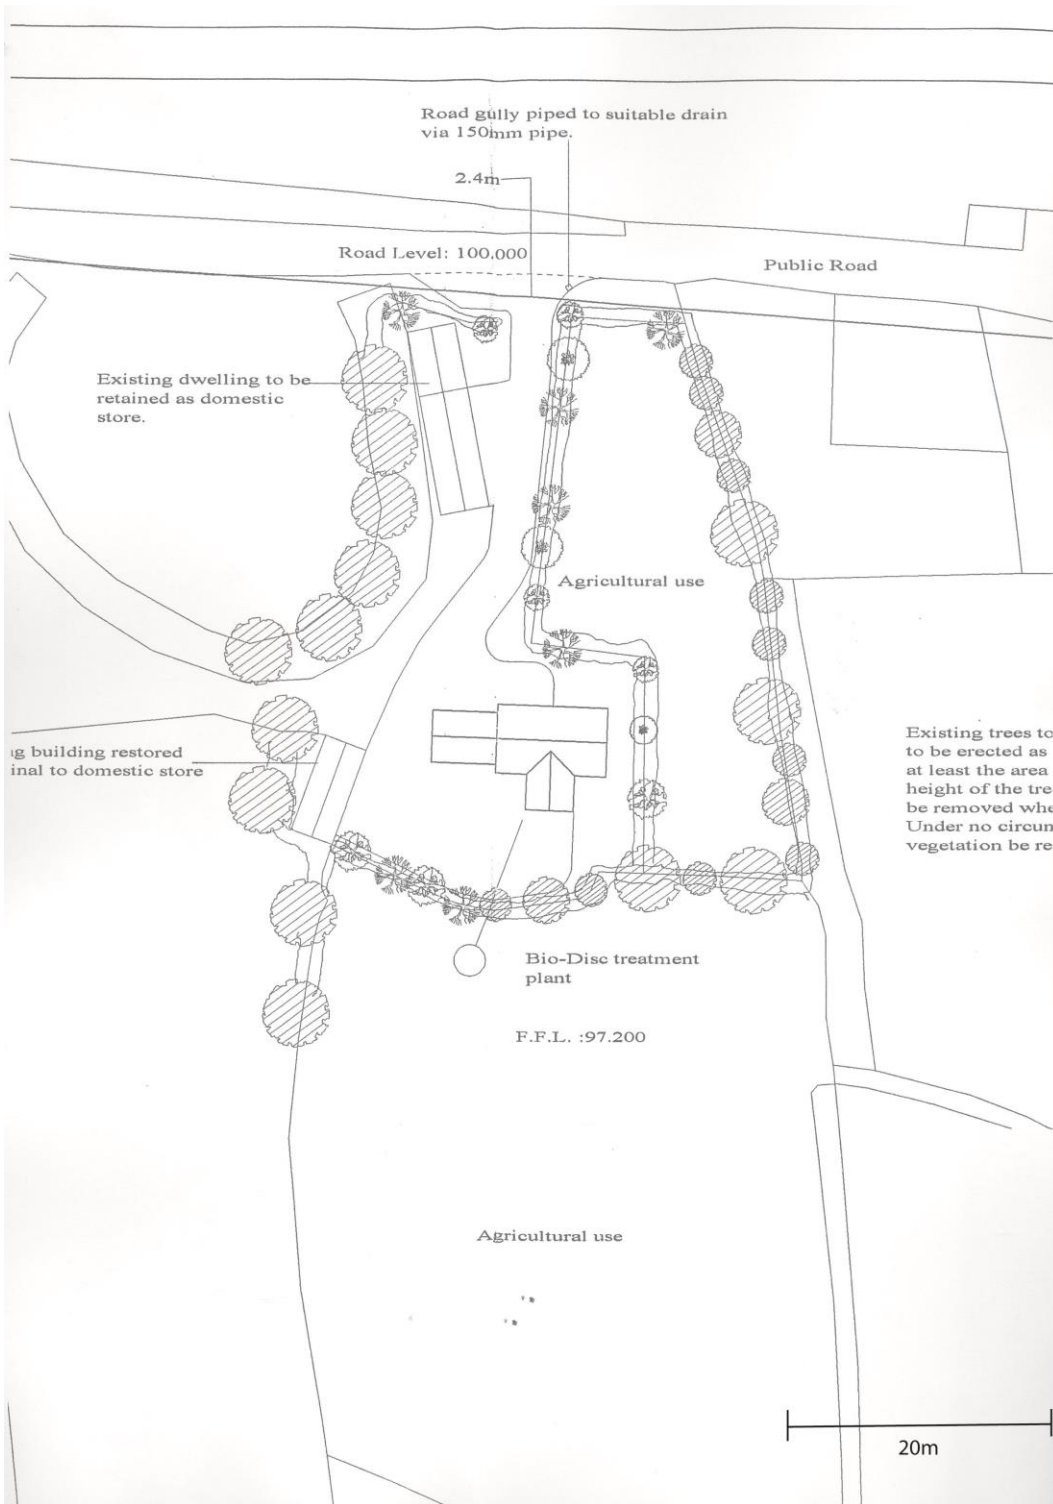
Architect's plan showing location of proposed replacement dwelling and garage
